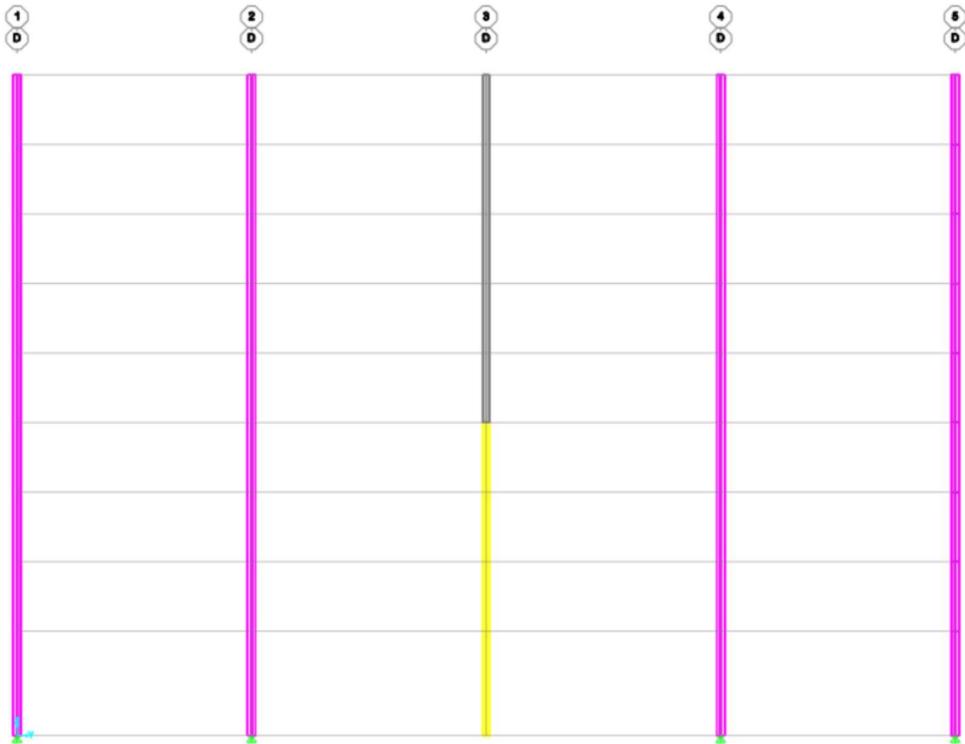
Column cross-section layout in the face D (SAP2000)
